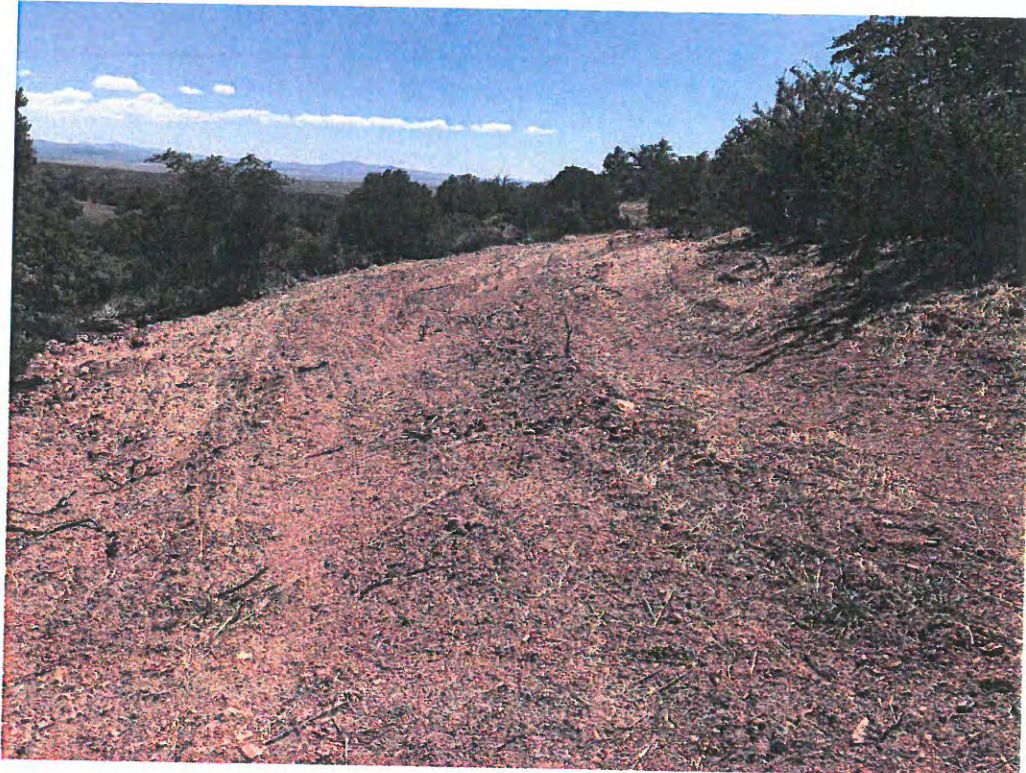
Reclaimed Drill Site and Road to Drill Site 8, 5/15/19
